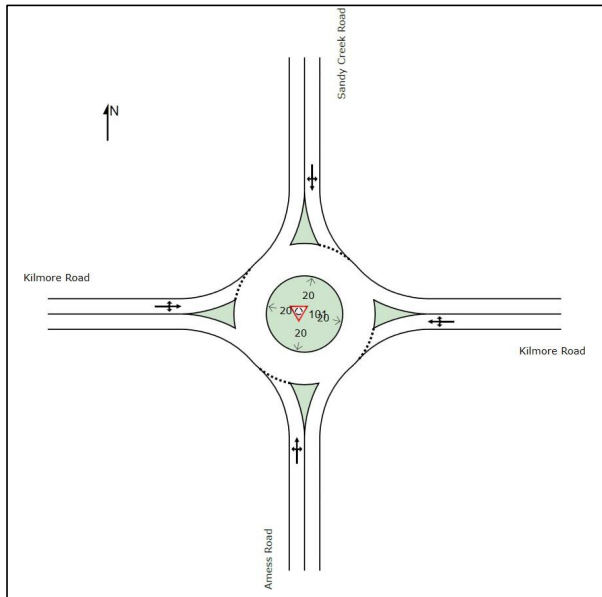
Model of the roundabout at the intersection of Kilmore Road, Sandy Creek Road & Amess Road (option 1)
